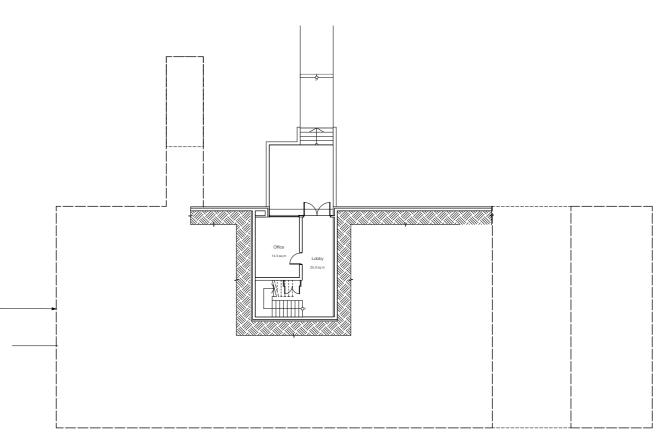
Existing Clubhouse - Lower Ground Floor Plan
